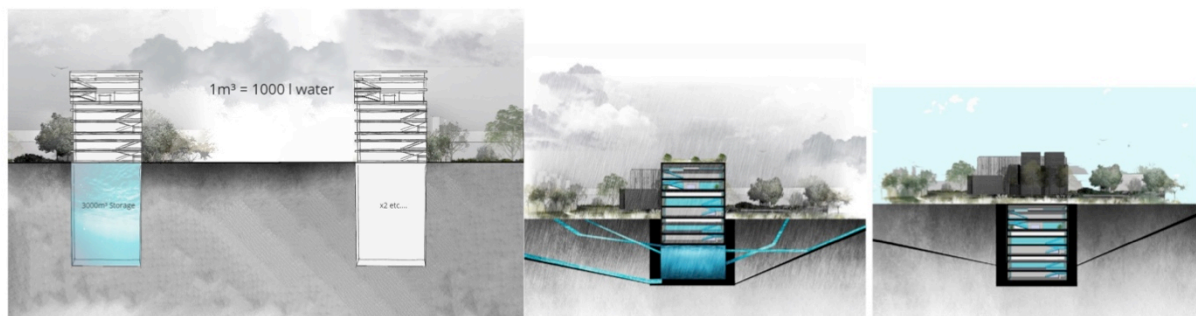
Underground structure for collecting, absorbing rainwater to prevent flooding in city and similar structures can be implement around city. Drawing by Matthias Schmidt.
